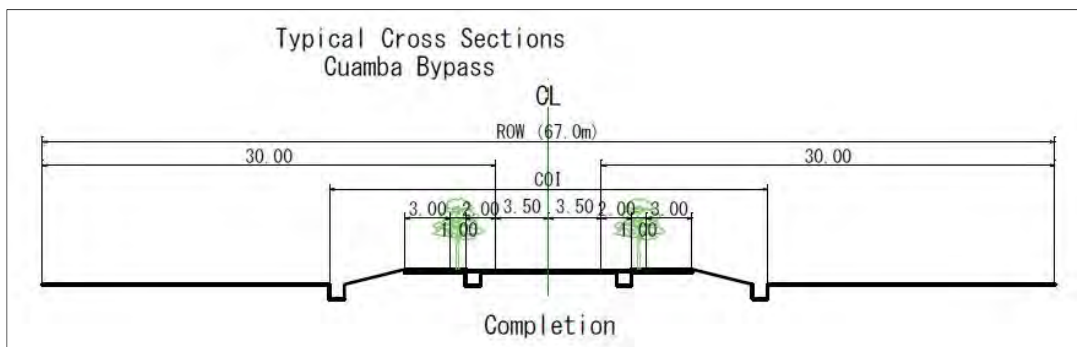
Typical Cross Section (draft/one lane on each side, ROW = 67.0m/Cuamba Bypass Road)
